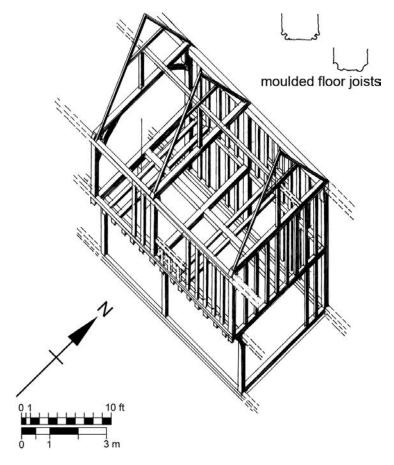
Isometric view of 40 Head Street (corpus no. 29), based on Richard Shackle's measured drawings made before demolition in 1985. Moulded floor joists are shown in cross-section (not to scale). The orientation of the building is uncertain because the drawings show conflicting information
